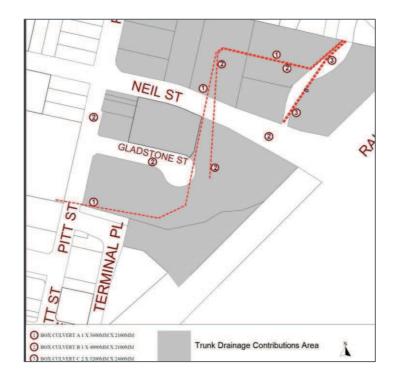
Extract from Trunk Drainage Works Plan for the Neil Street Precinct from Holroyd Section 94 Contributions Plan
